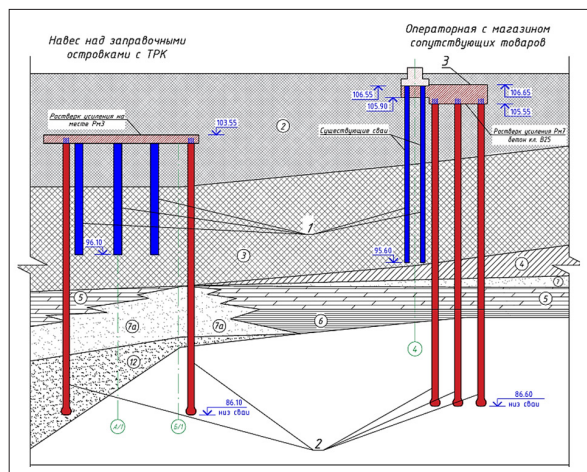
Engineering-geological section: 1 - existing driven piles; 2 - bored-injection piles ERT ; 3 - supplied monolithic reinforced concrete cantilever beams for existing monolithic reinforced concrete grillages
